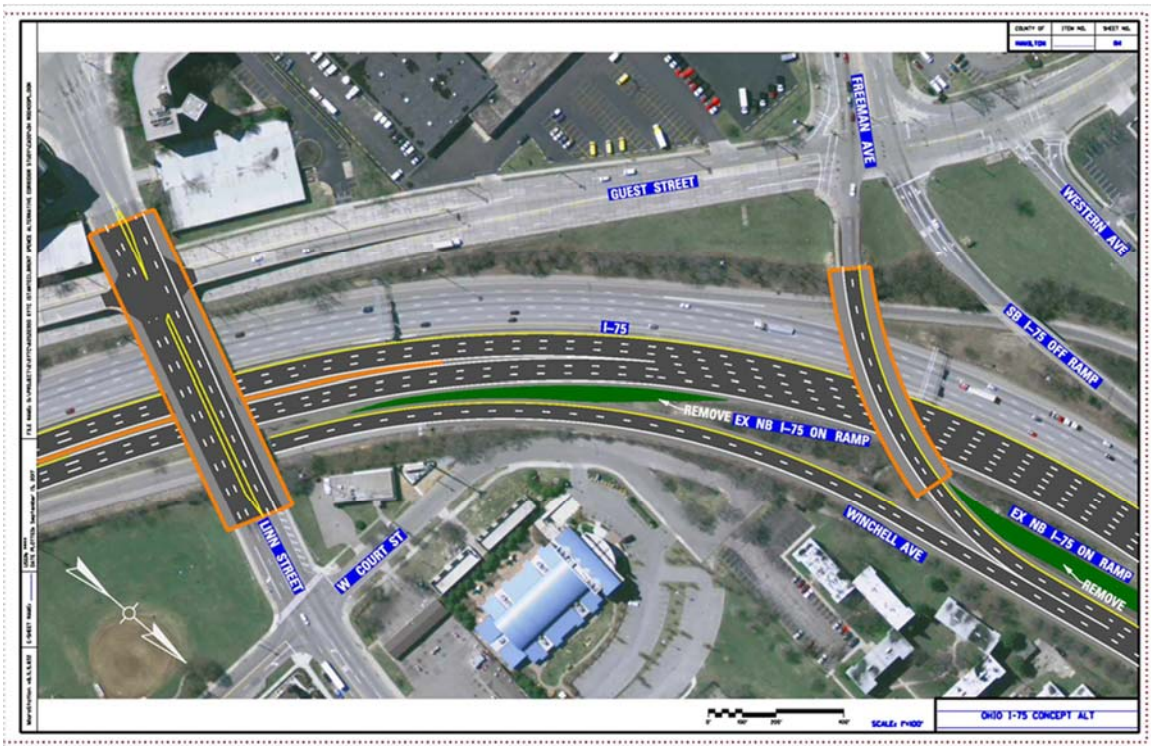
Reconstruction of Linn Street and Freeman Overpass Structures
